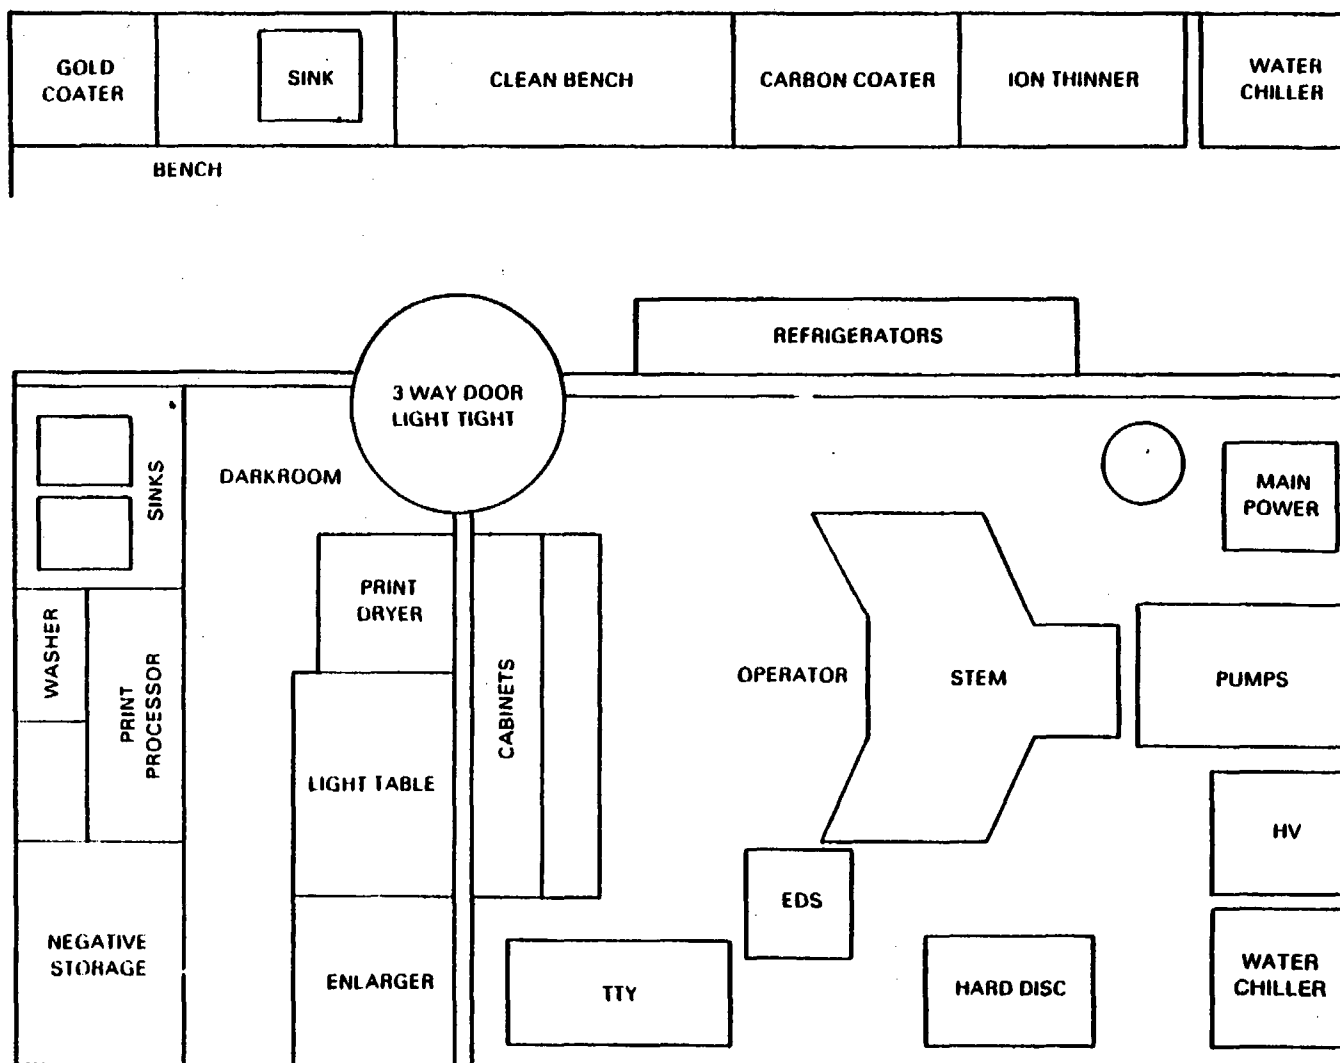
Laboratory 4M, Proposed Layout for STEM Laboratory.
